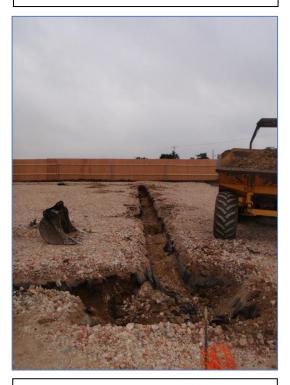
Excavation of Stanchion Bases 20-23 & linking foundation trenches, from the north
